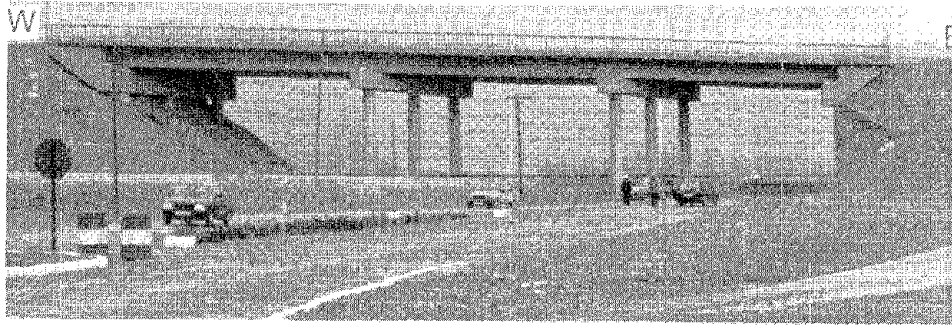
Severly damaged cross-over bridge on a highway for Erzincan-Kemah
